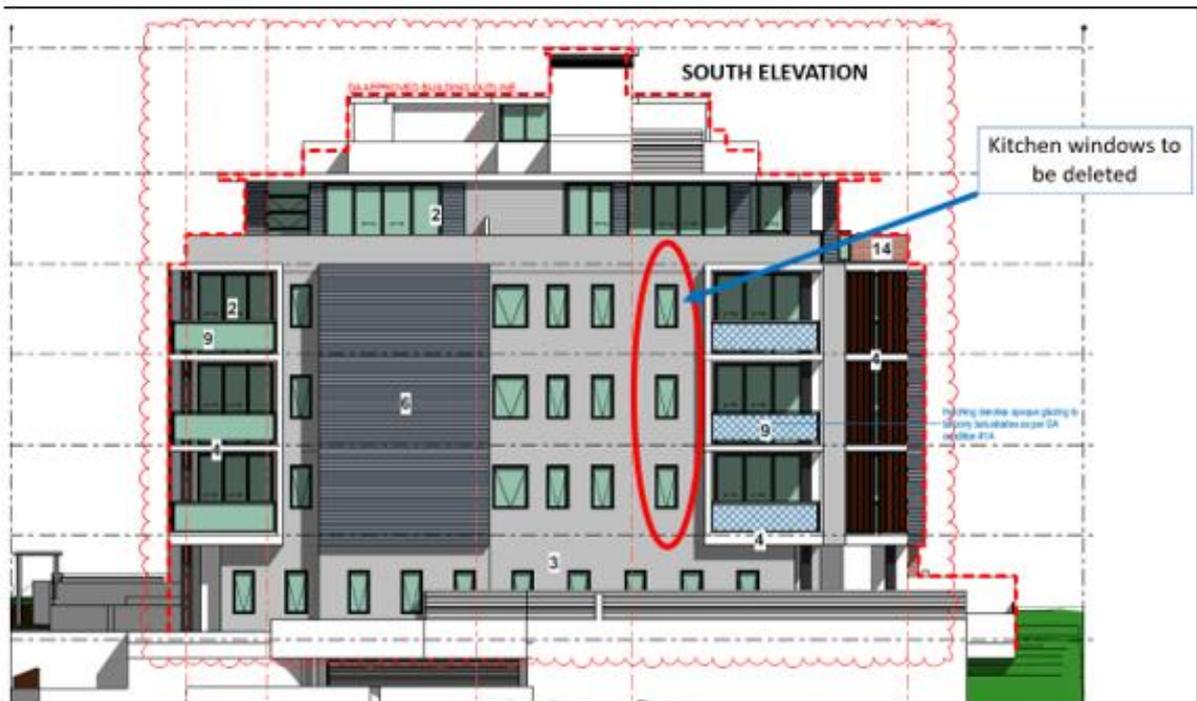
South elevation -kitchen windows to be deleted as per recommended draft condition.
